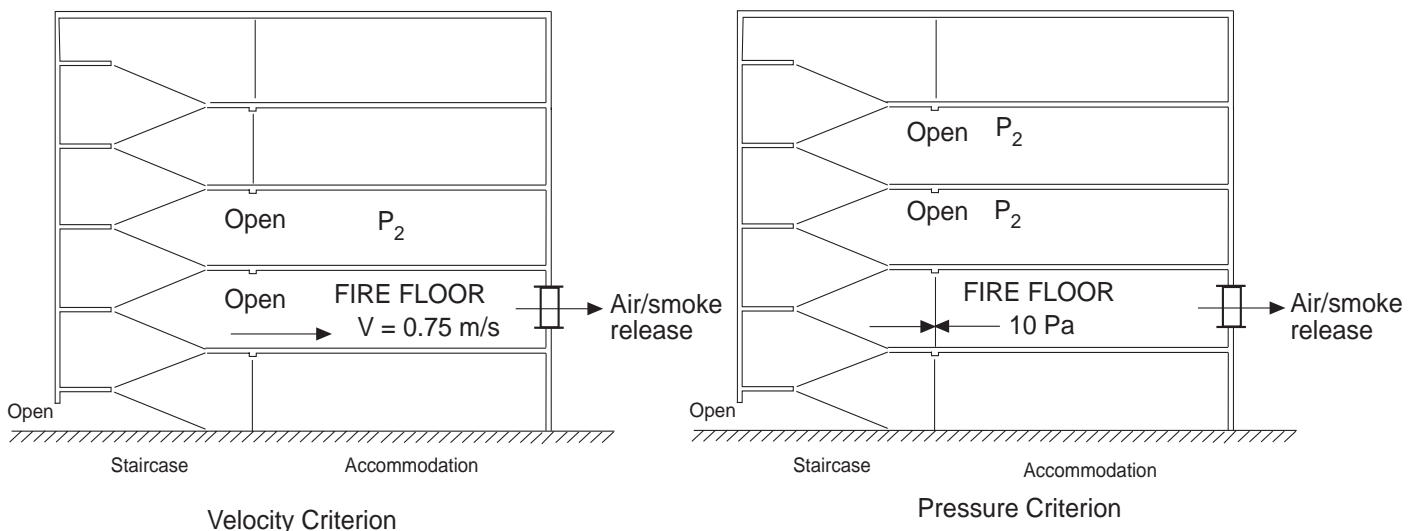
AIRFLOW LEAKAGE THROUGH OPEN NON-FIRE FLOOR DOORS
